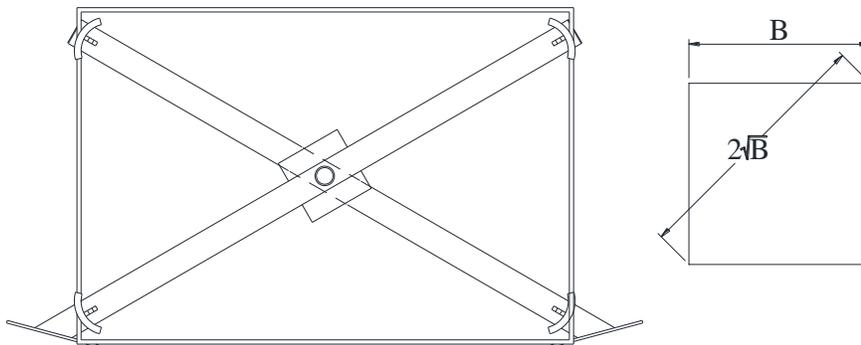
Collapsed SSU cross members allowing for perimeter cable installation
